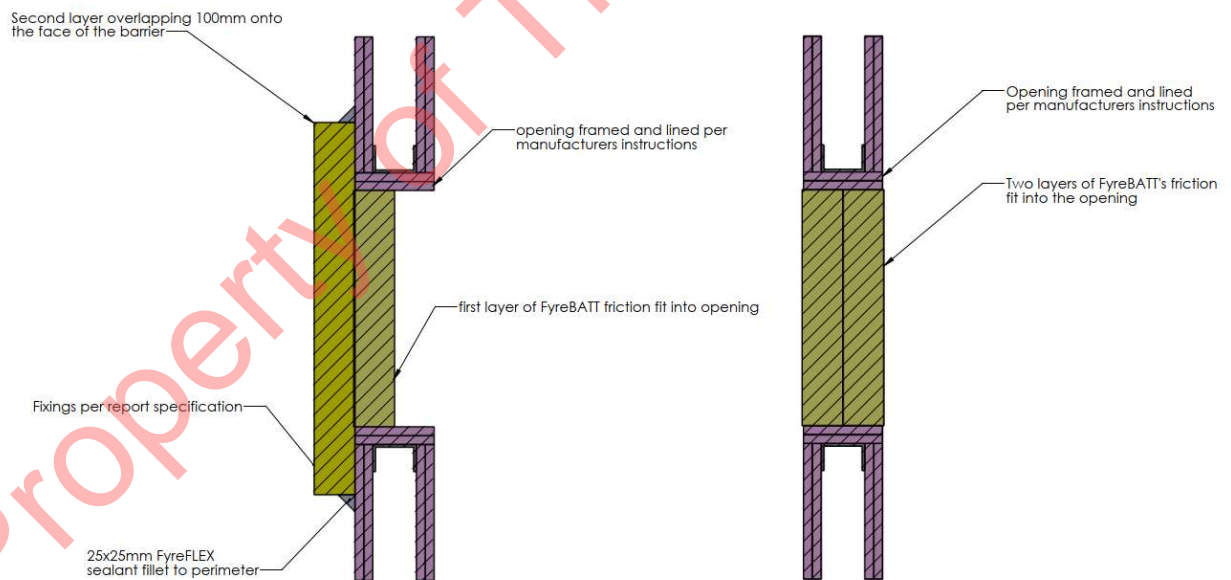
Blank seal protected with two layers of FyreBATT in plasterboard wall system
